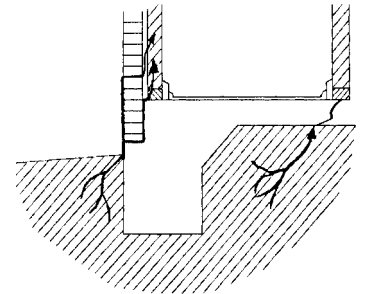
Monolithic slab—tile floor (arrows indicate possible termite entry points).
